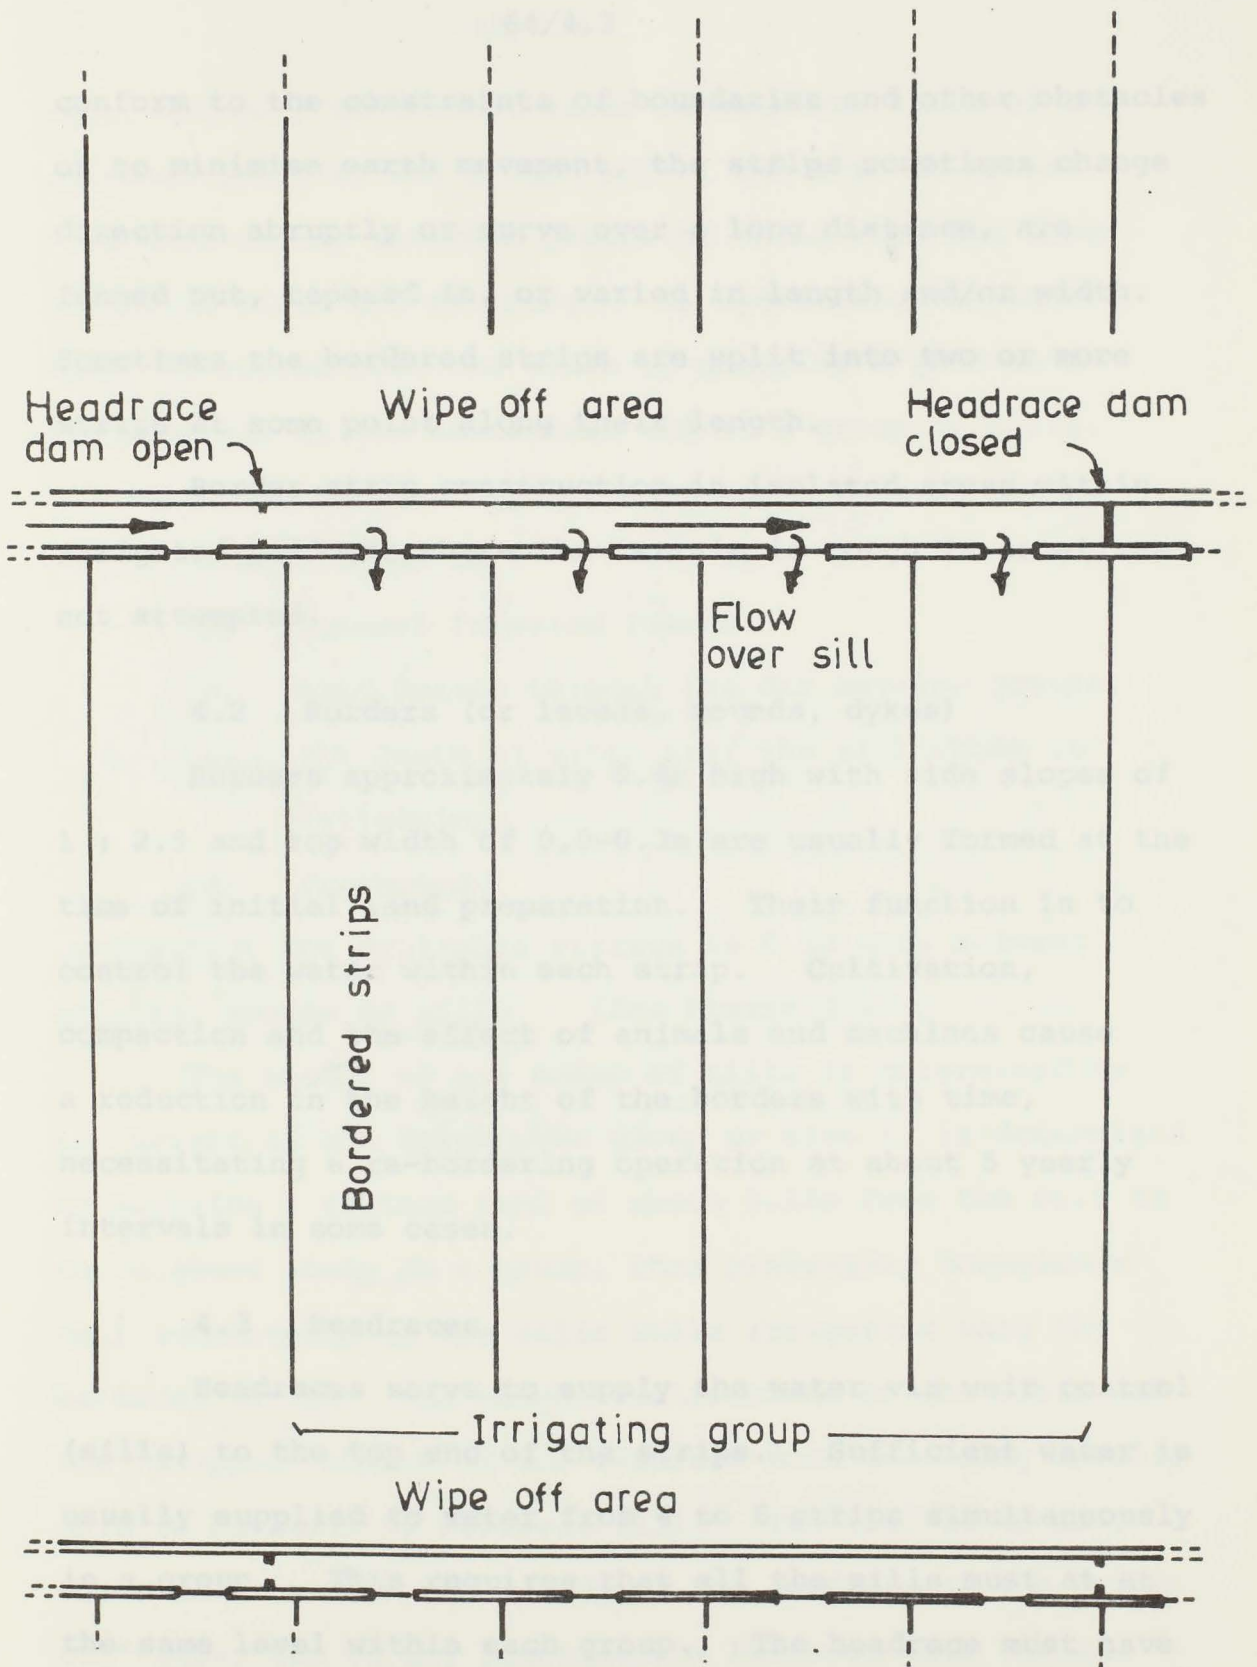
Schematic diagram of a typical bordered strip irrigation layout.
